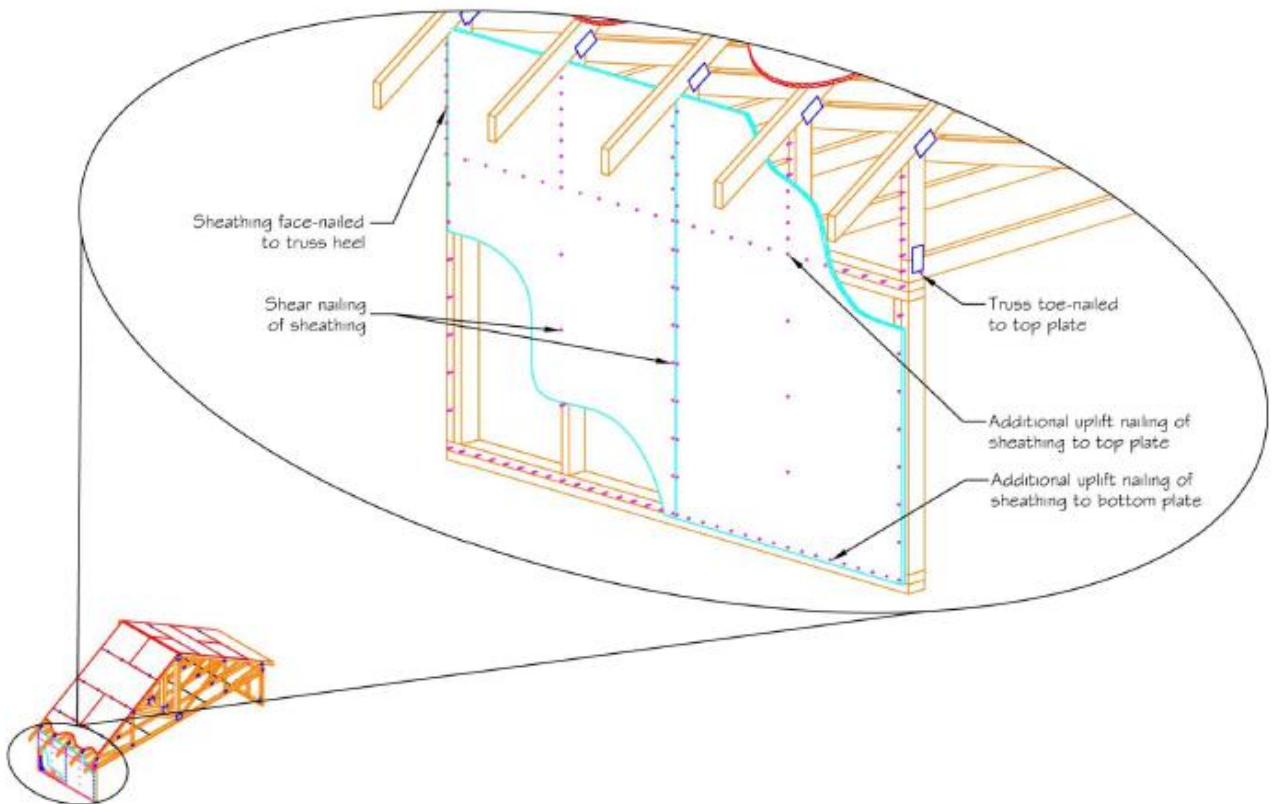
TallWall/Windstorm OSB sheathing connection detail
